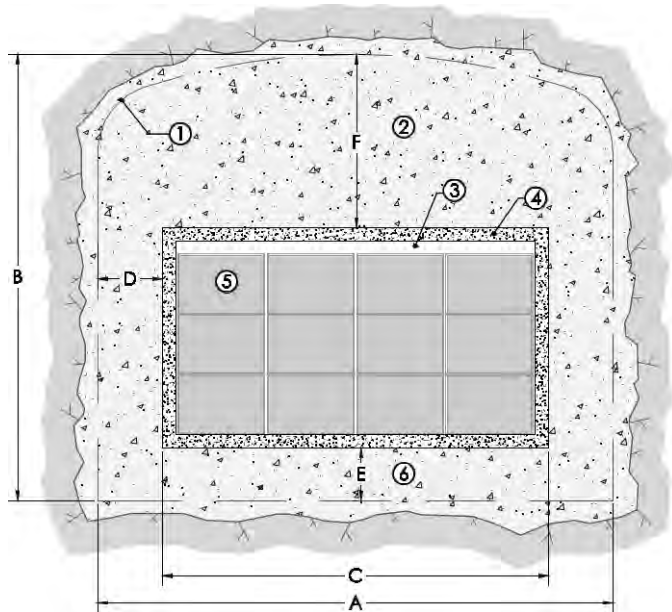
Schematic cross-section through a caisson in the BHK vault according to Elfving et al. (2013). Numbers indicate (1) tunnel contour, (2) concrete backfill, (3) grouted void space inside caisson, (4) concrete caisson wall (0.5 m thick), (5) steel tanks, and (6) concrete below caisson. Nominal dimensions according to the design are  $A = 20.6$  m,  $B = 19.6$  m,  $C = 15$  m,  $D = 2.8$  m,  $E = 2.4$  m, and  $F = 8.8$  m.
